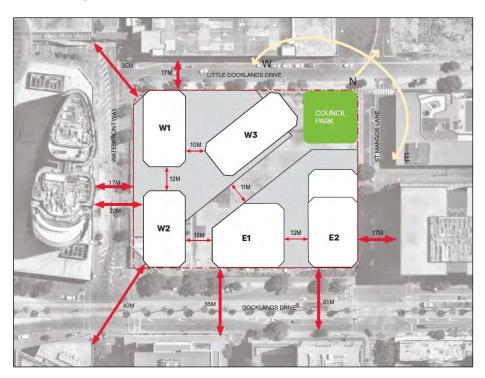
Proposed DP Section 4.8 (Building Separation, Light and Views)
